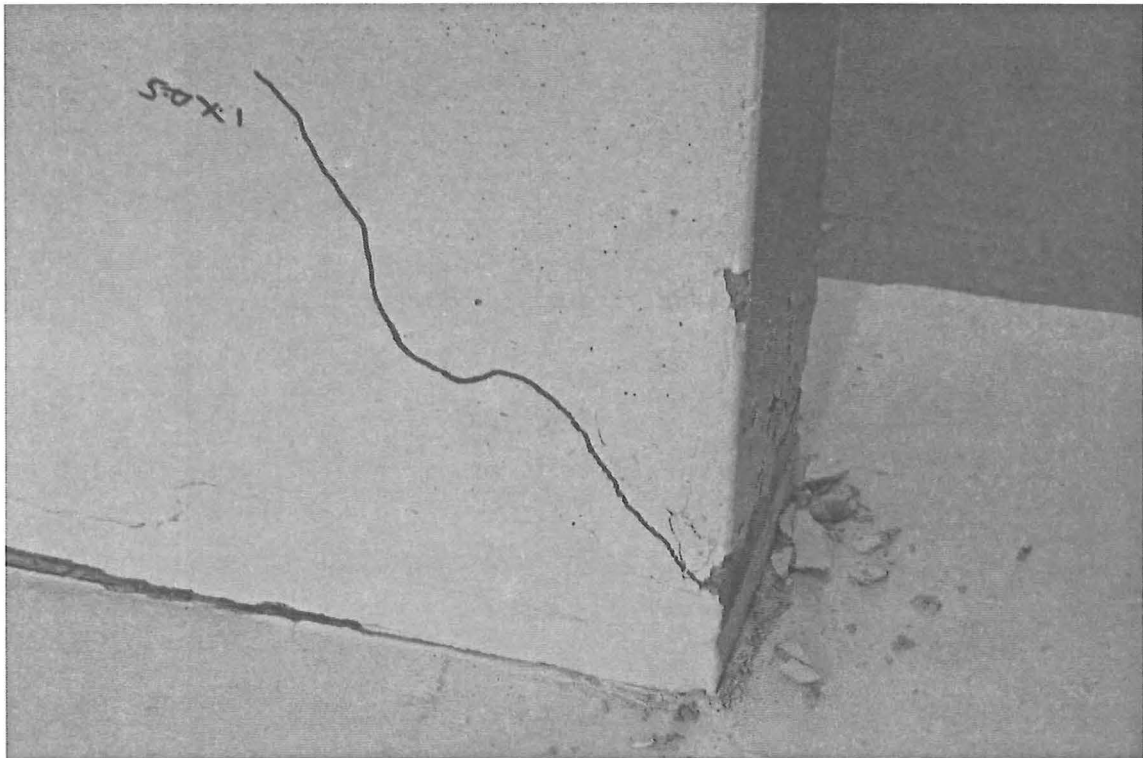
Incipient concrete spalling in the north-western corner of Unit 2 at +5.0x1.
